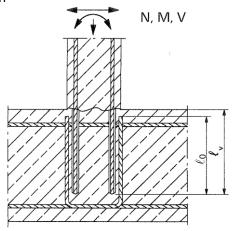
Rebar connection for components stressed primarily in compression. The rebars sre stressed in compression
